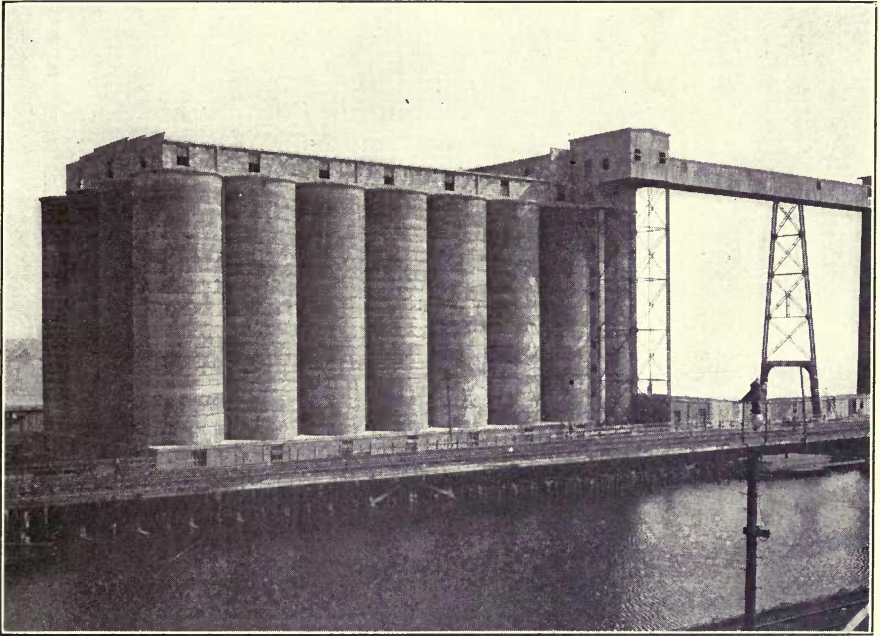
TYPICAL CONCRETE GRAIN ELEVATOR.
